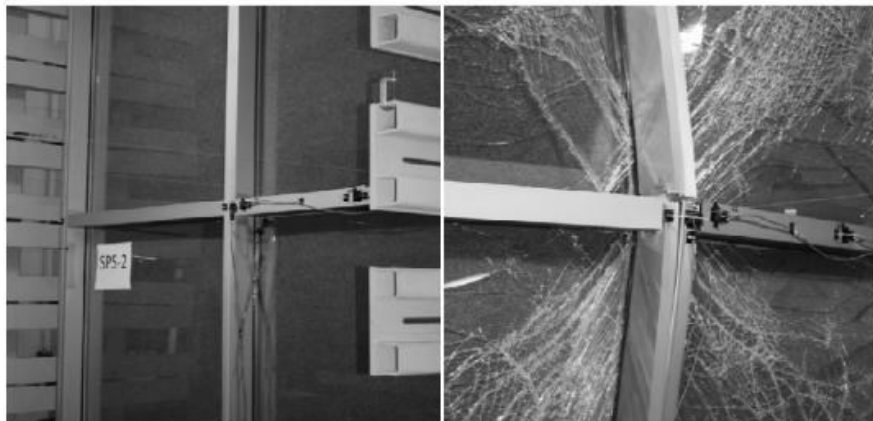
Curtain wall specimen in the reaction frame (inside looking out): a) Un loaded specimen b) Loaded specimen just after mullion fracture (Kennedy and Weggel, 2009)
